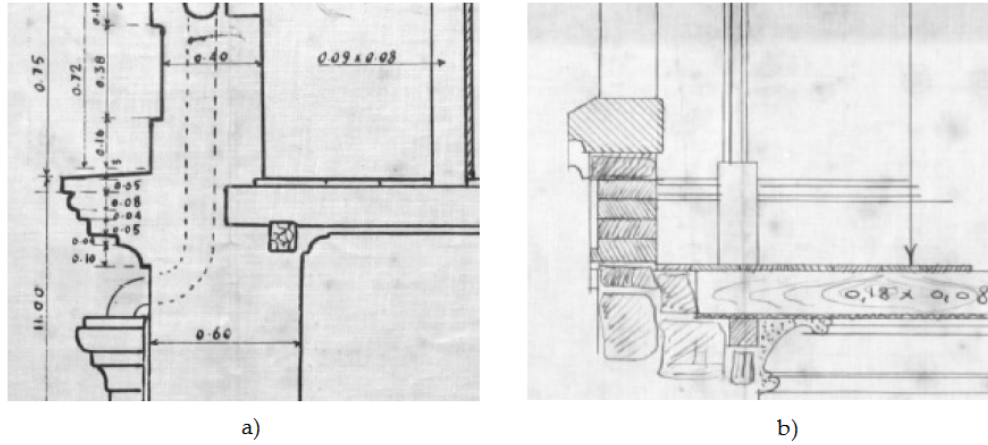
Floor-wall connections in -a)Pombalino building and b)Gaioleiro building (adapted from [6])
